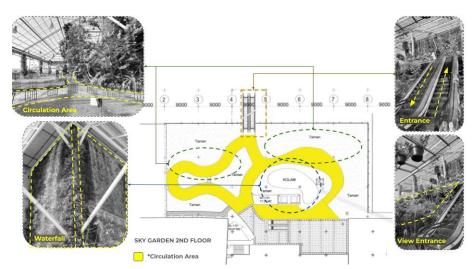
Second Floor Sky Garden Plan (Author, 2025)
